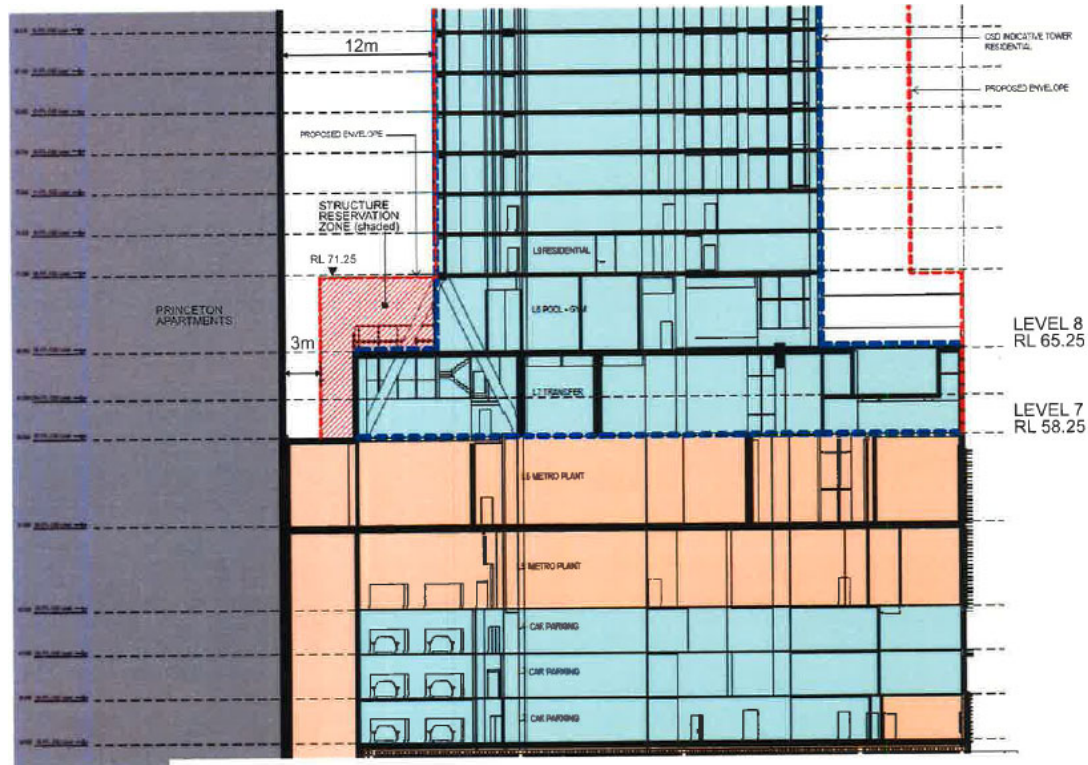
Pitt Street South Concept SSD DA – Building Section (Source: SSD 8876 Concept Stamped Plans)
